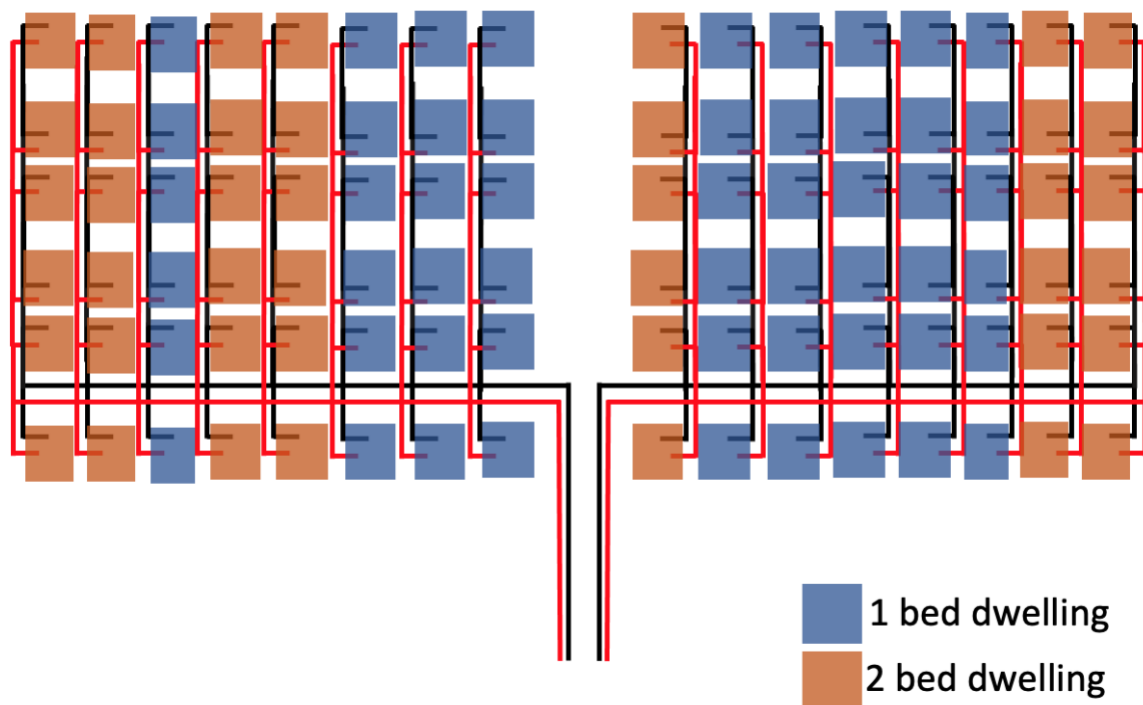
Real distribution system and dwelling plan of the case study CHN, showing all 6 floors and the type of dwellings within each floor
